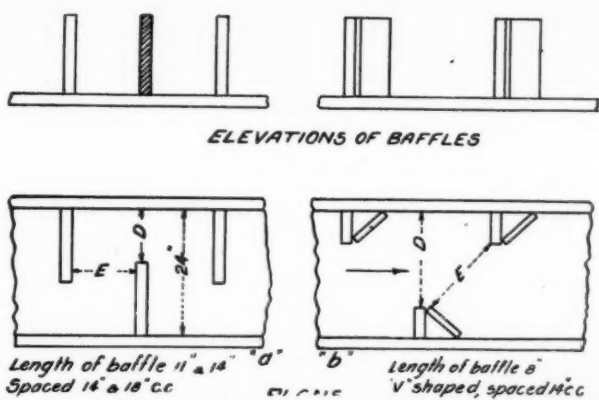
GENERAL PLAN OF APPARATUS, SHOWING TYPES OF BAFFLES USED
